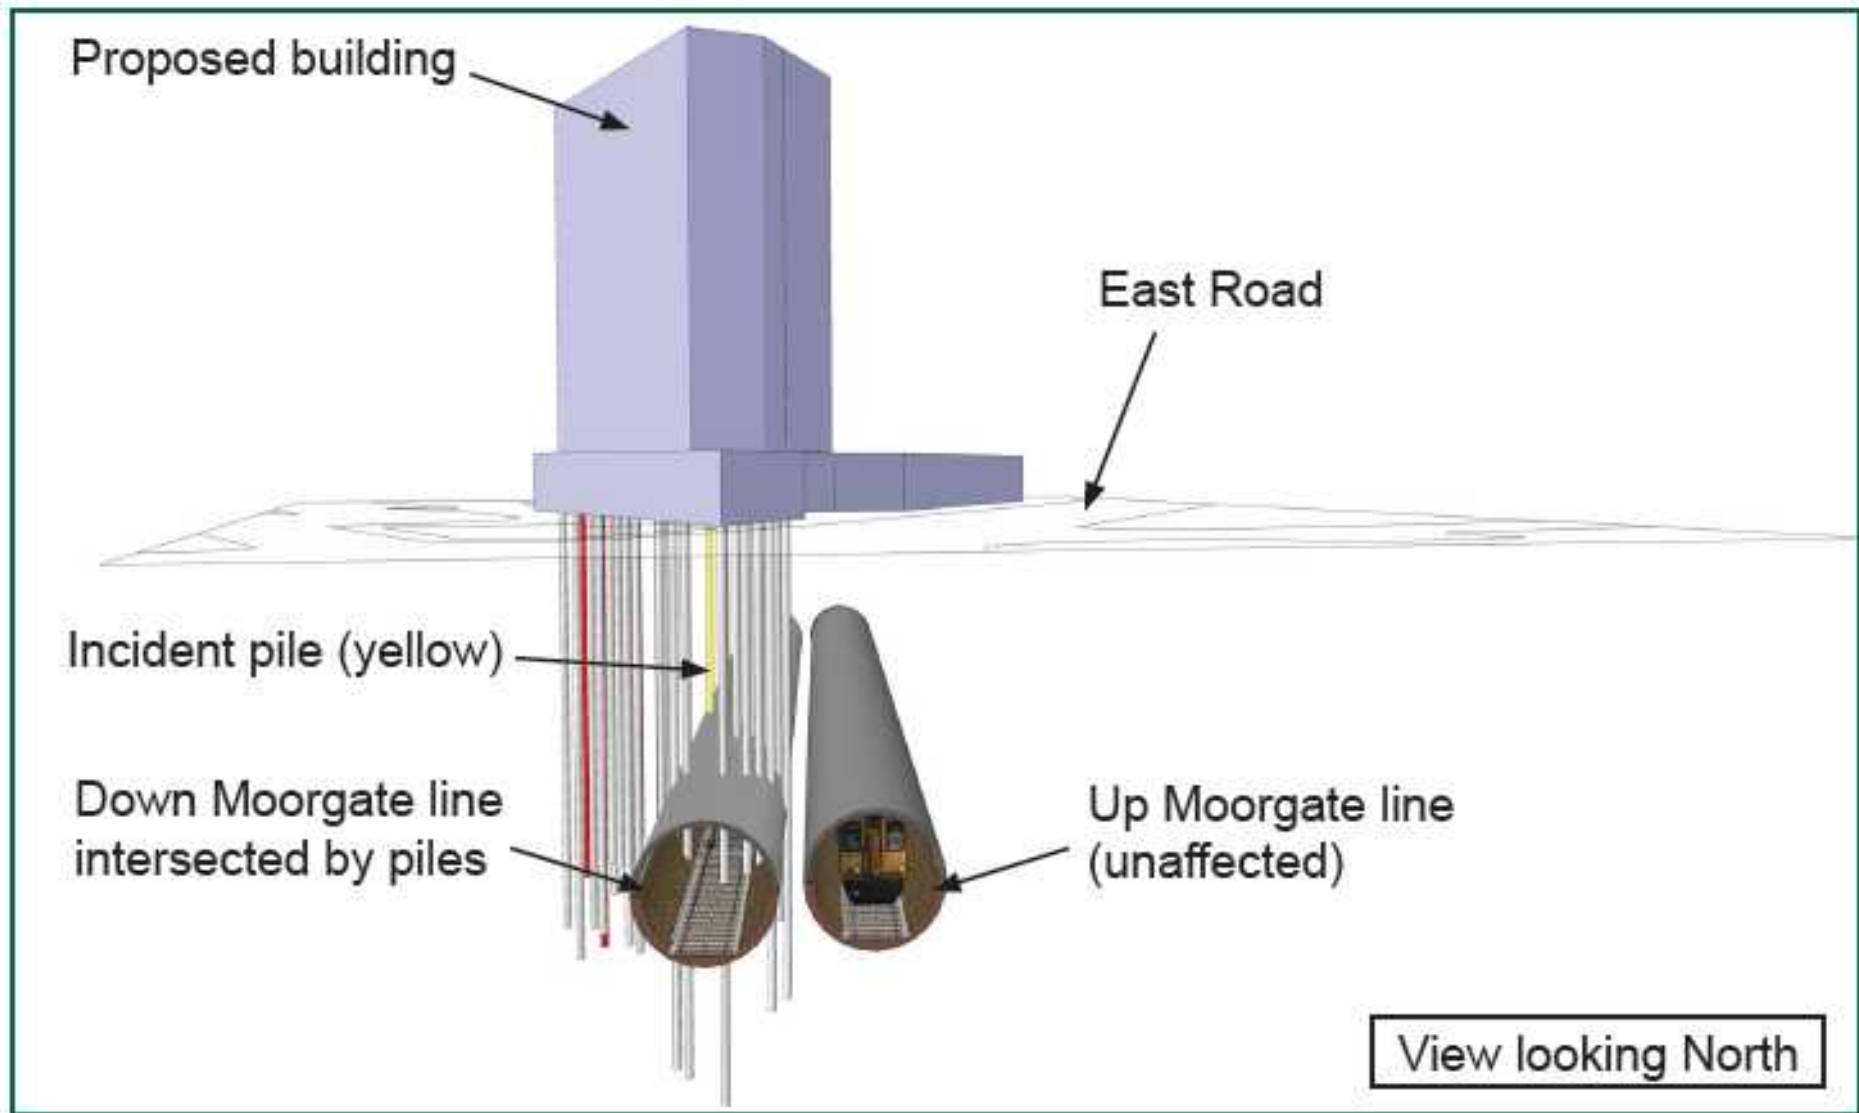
Scale diagram showing proposed foundation layout and extent of interaction with railway tunnel
